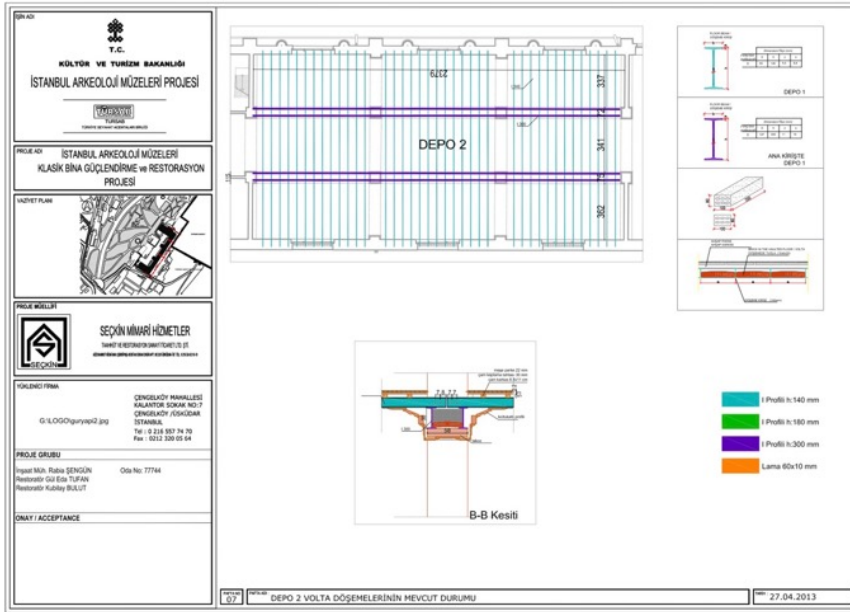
The survey drawing of Hall 26 jack arched flooring (*Güryapı İnşaat* AutoCAD file, drawn by Rabia Şengün, IDSMArchive)
